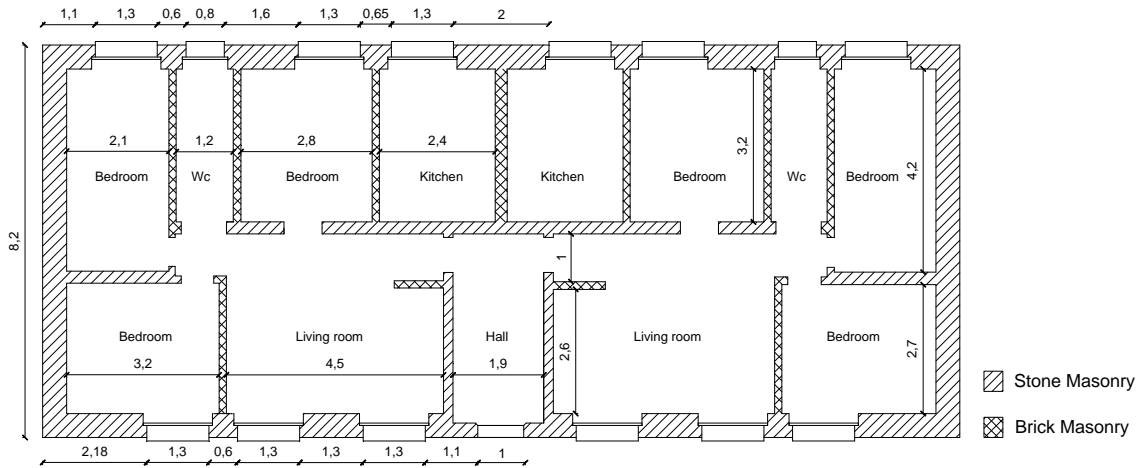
Plan of the first and second floors (Lamego 2014).
